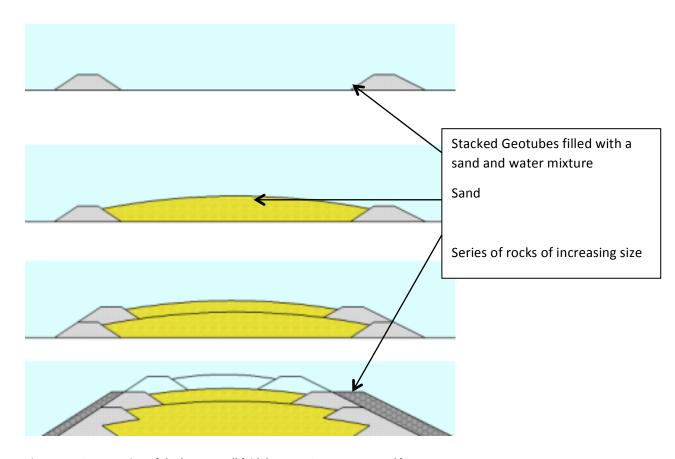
Cross section of the lagoon wall (Tidal Lagoon Swansea Bay, n.d.)
